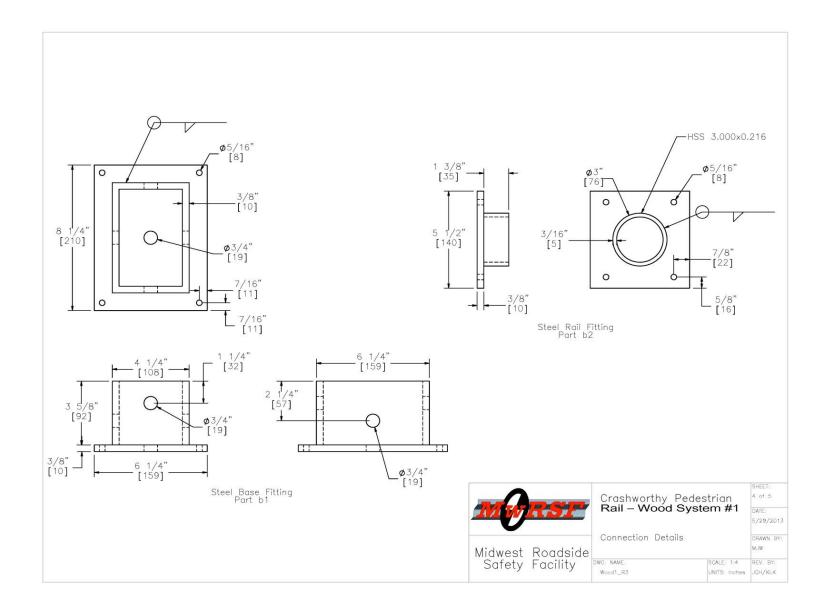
Modular Wood Rail, Design Concept WOOD1 (Sheet 4 of 5)
